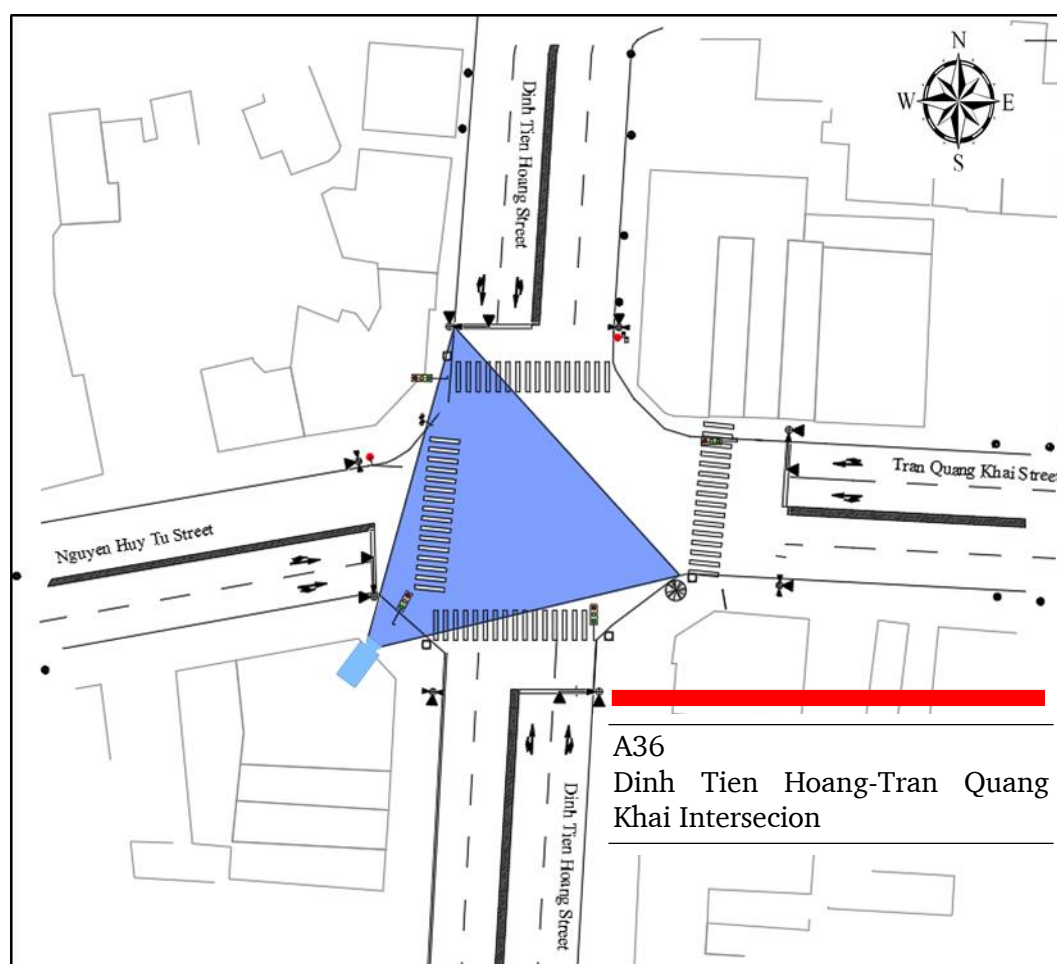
Intersection and Surveyed Layout at Dinh Tien Hoang-Tran Quang Khai Intersection
